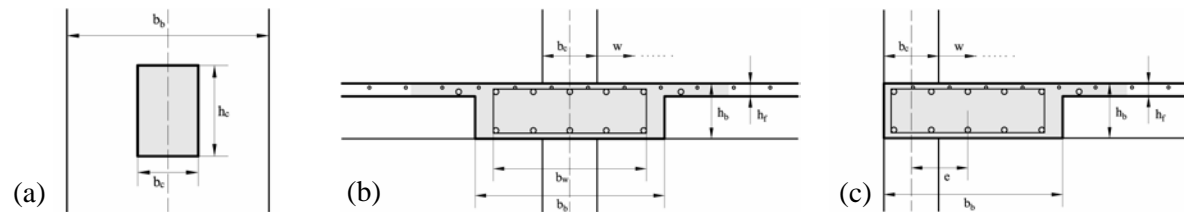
Graphic description of variables used in Table 1, corresponding to: plan of interior connection (a), and elevation of connection belonging to central (b) and edge (c) frame (from [12])
